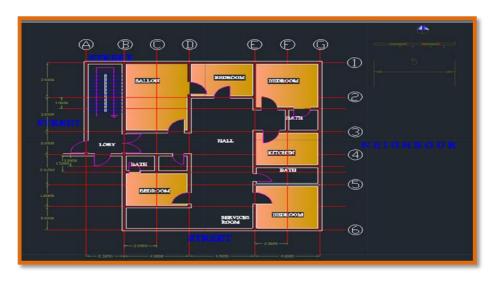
ground floor plan in Eilham Ahmed Babeker house(Source: Author)
